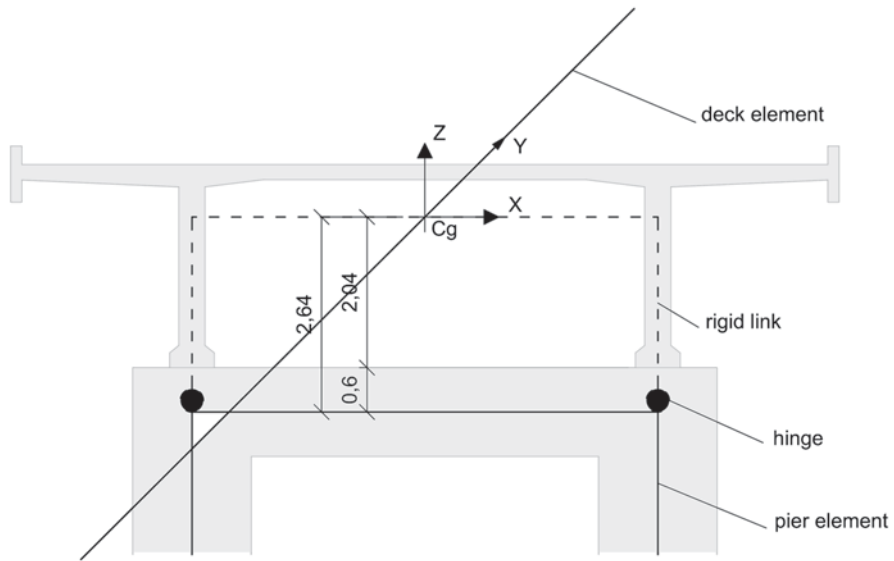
Details of the FE modelling of the pier-deck connection (dimensions in m)
